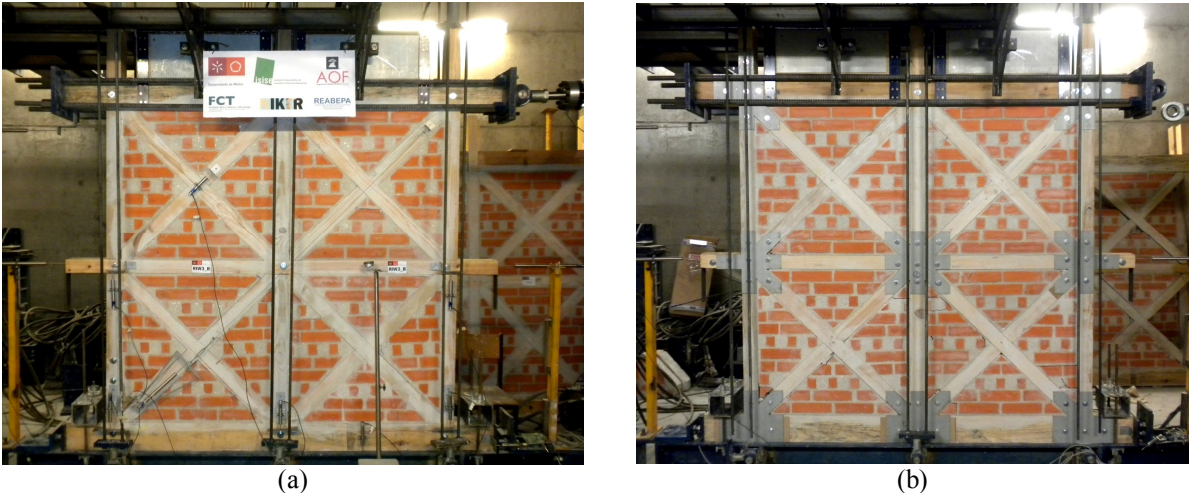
Strengthening adopted: (a) bolts; (b) steel plates
